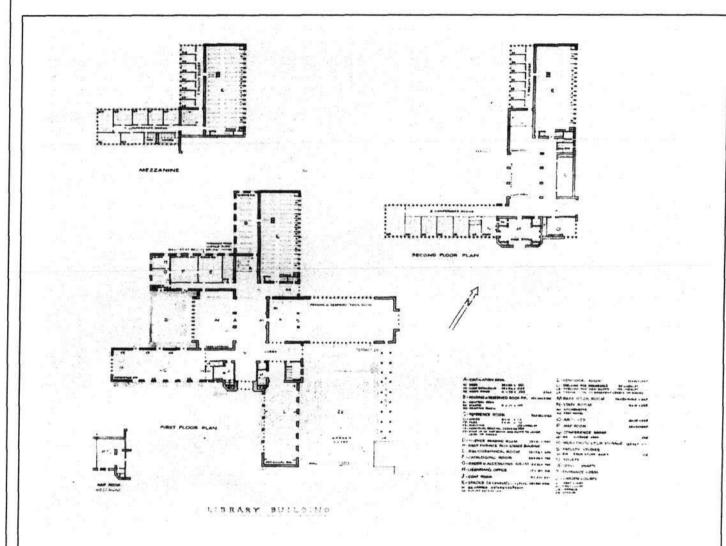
John C. B. Moore and Robert S. Hutchins, Campus Development Plan and Library, Goucher College, 1938. Library plans. (Photo courtesy Goucher College.)
